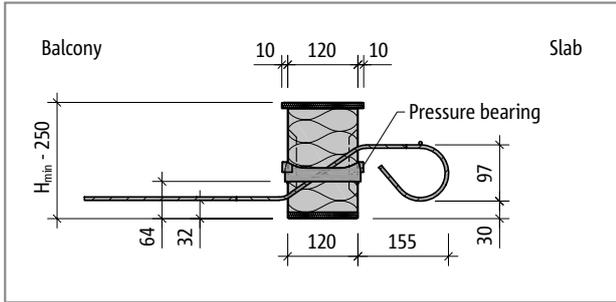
Schöck Isokorb® XT type Q-V1 to Q-V4: Product section
